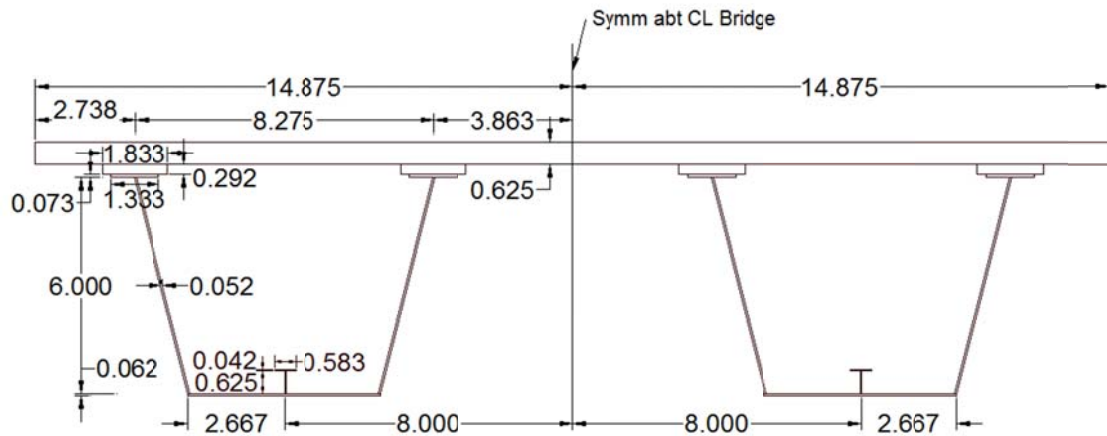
Typical steel BOX cross section (1) for L = 180ft
